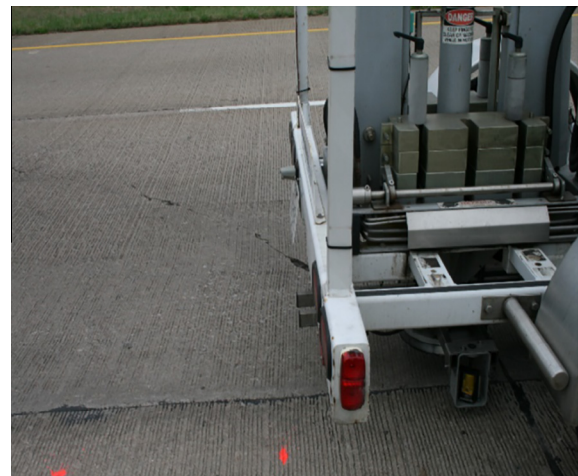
Diagonal cracking in the area of longitudinal joint with broken tie bars.
